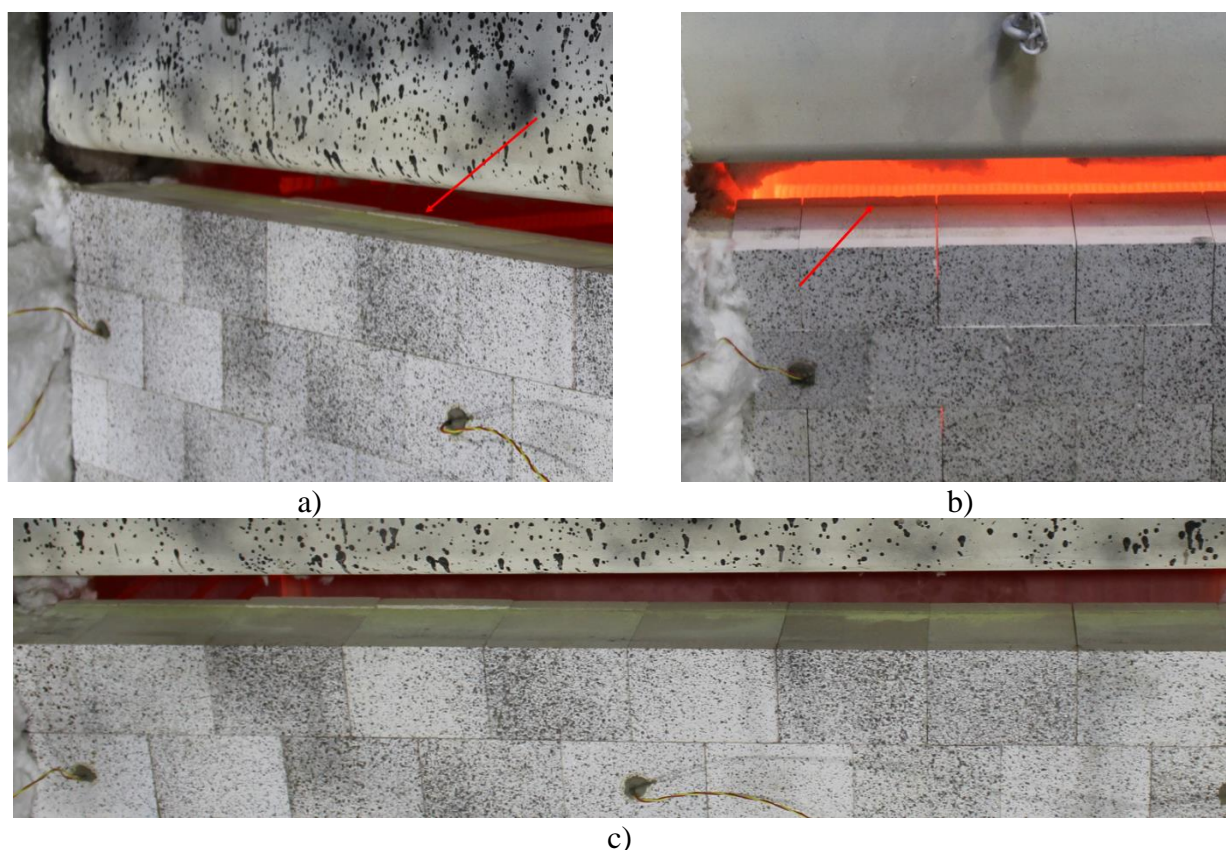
Test series S03 – Damage in the wall upon completion of the test - Cracks in the interface between load application beam and wall: a) S03.HT.LL8.01, b) S03.HT.LL8.02; c) S03.HT.LL8.01
